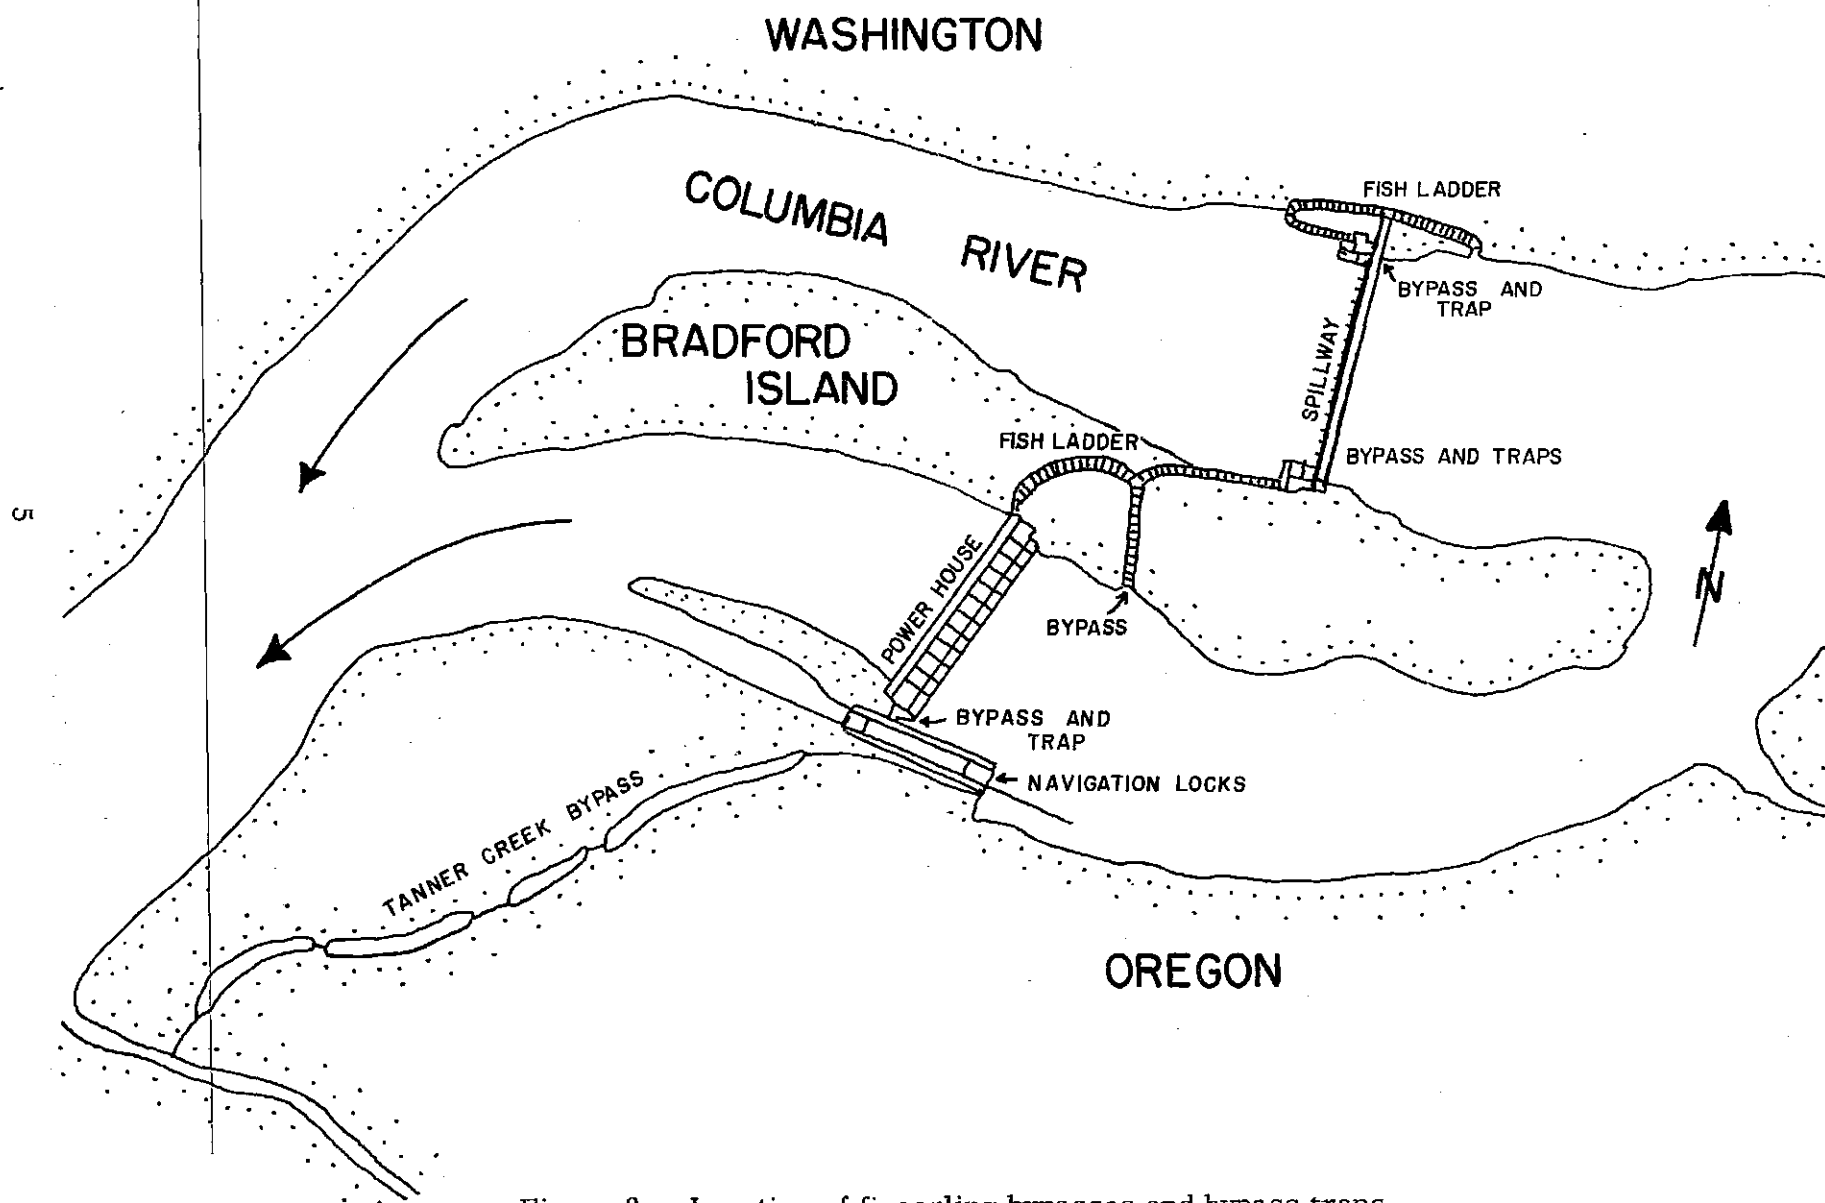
Location of fingerling bypasses and bypass traps at Bonneville Dam.
